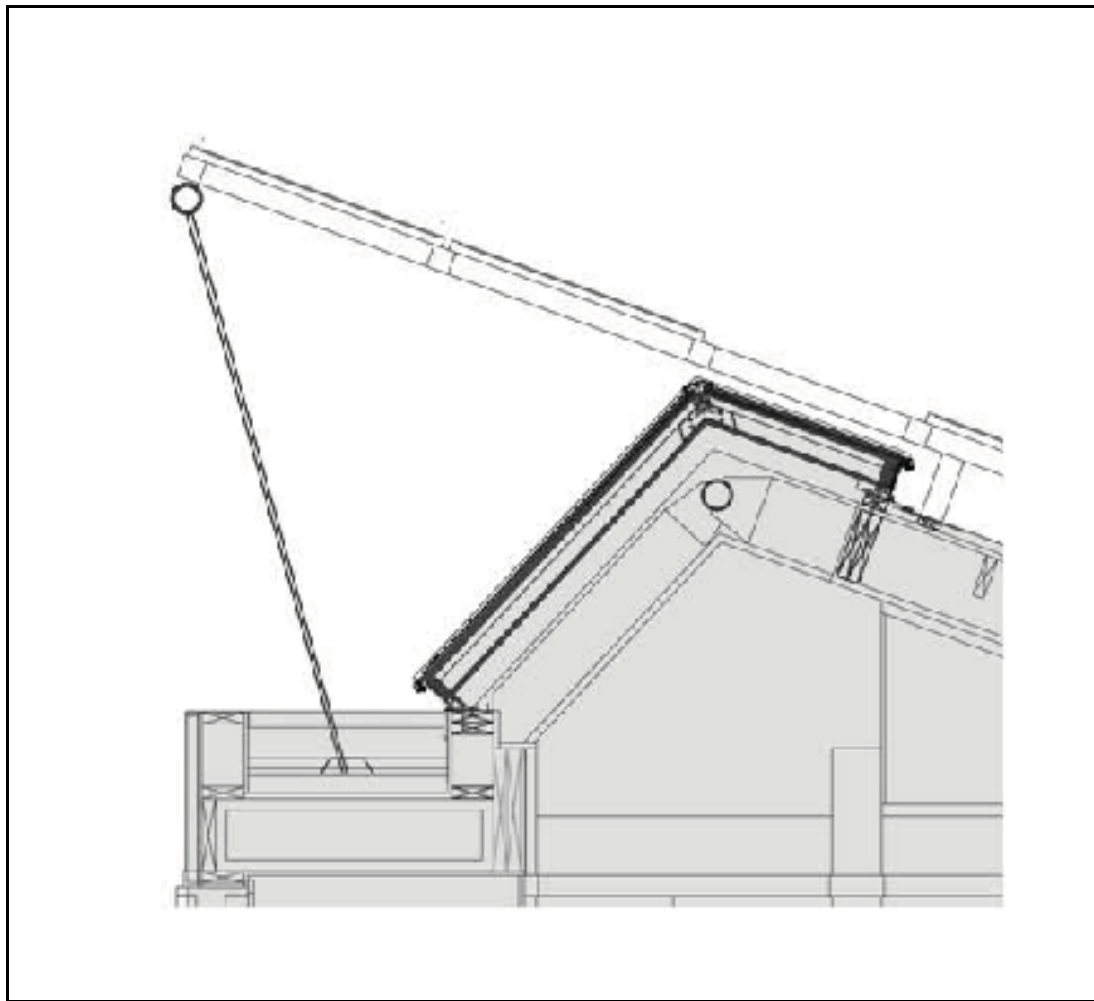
Shop drawing completed by team in conjunction with manufacturer.
